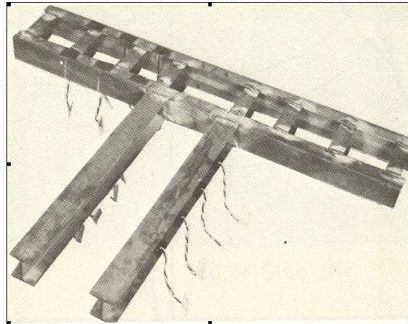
I-shape shear reinforcement (Hawkins and Coley, 1974)
